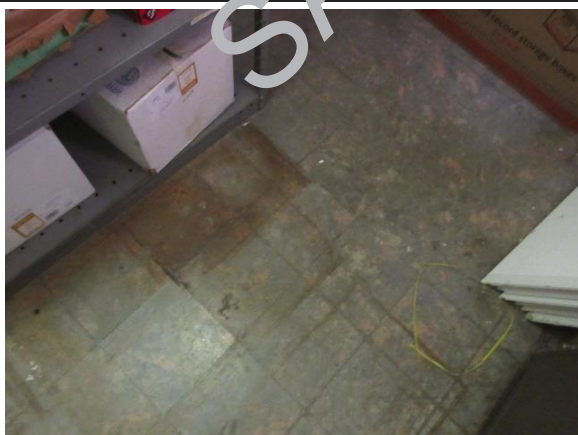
SUSPECTED VINYL-ASBESTOS FLOOR TILES
